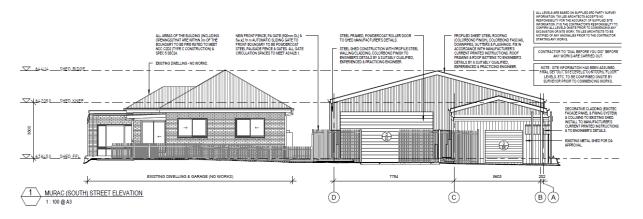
Proposed Murac Street Elevation, Existing Shed is to the right of frame with the Proposed New Shed to the rear of the Site, the Existing House is to the left of frame – TLA
